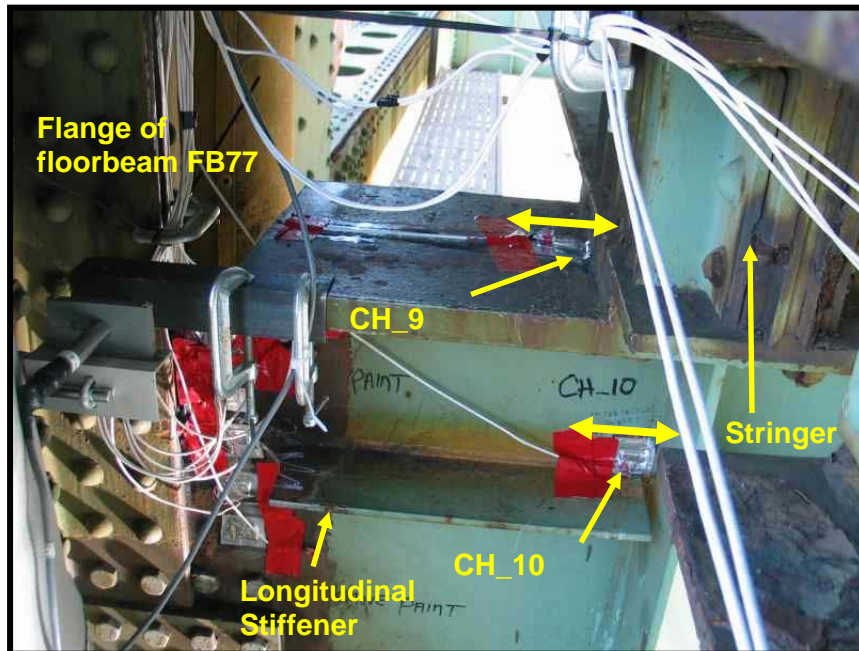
CH_10 installed on the web of floorbeam FB77 at the longitudinal stiffener to transverse stiffener detail (view looking north)
